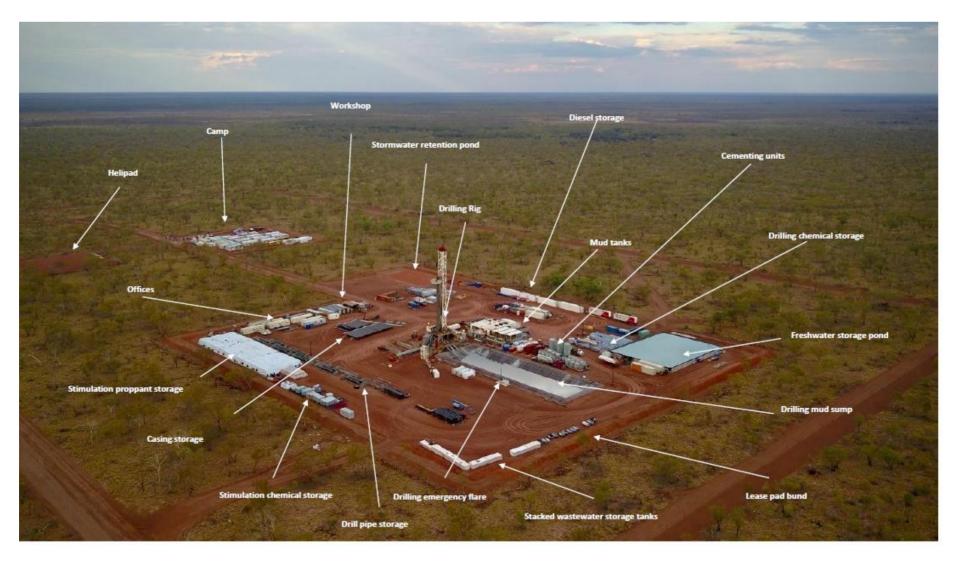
Typical well site layout during drilling; this is the existing Kyalla 117 N2 site
